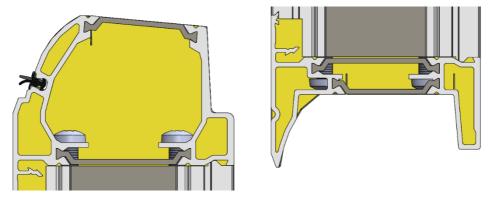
Test to compare panel and frame sections shape where the yellow shape is the panel section.
